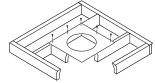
Firestop Spacer with Attic Space Above Ceiling
